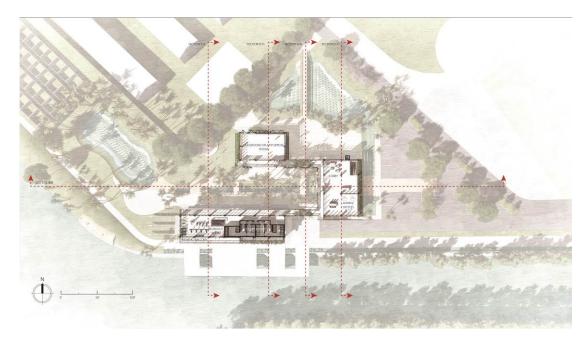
Second Floor (Source: Author, Justin Manongdo)
